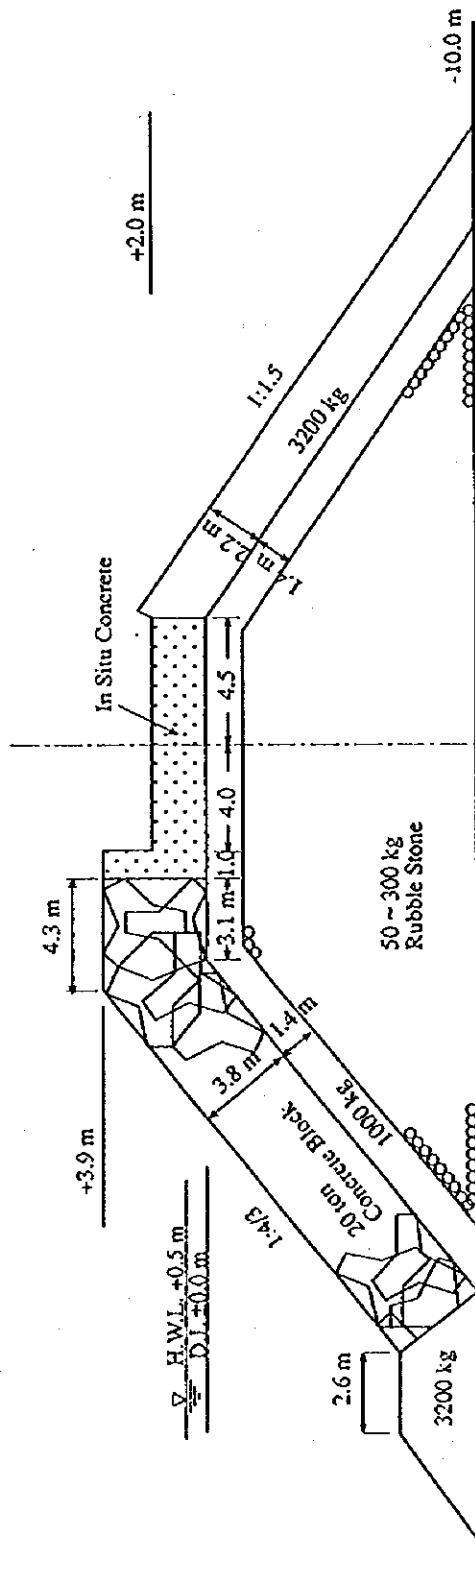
Standard Cross Section of Breakwater Rubble Mound Type (-10.0m)
